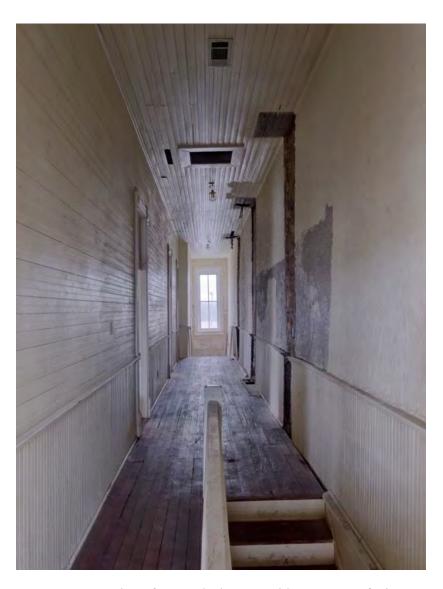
Interior of Second Floor Corridor. Camera facing: West
